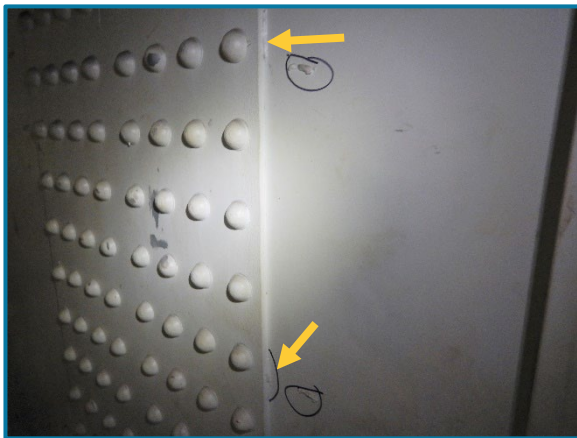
Typical tack welds at the interface between the web plate and interior splice plate of Pier Cap 11A (looking south at south web plate splice).
